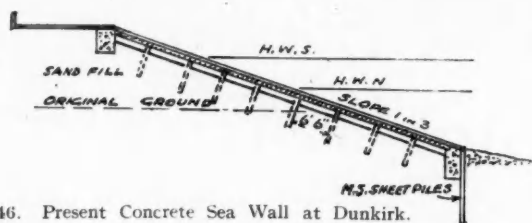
Present Concrete Sea Wall at Dunkirk.
